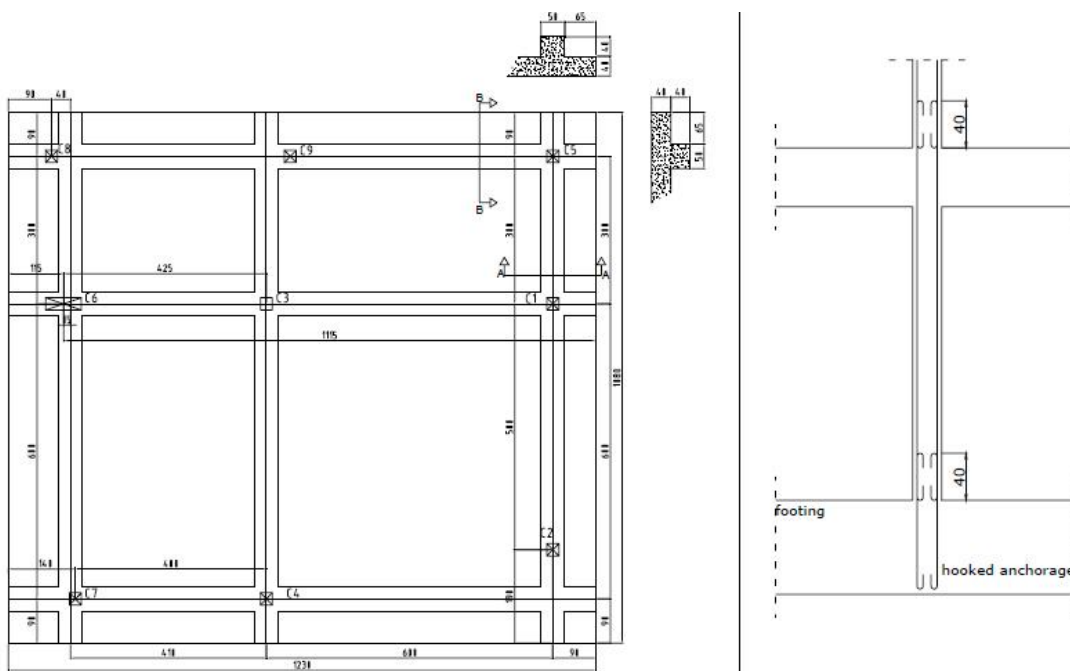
Footings plan of SPEAR (units are in mm) [78].
